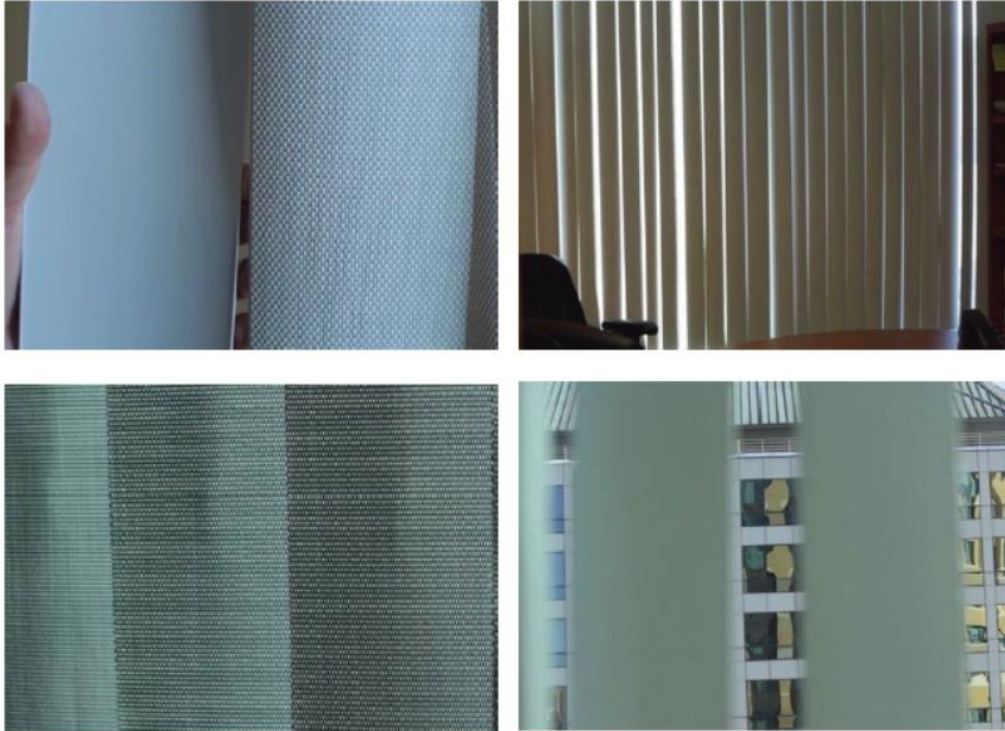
Indoor views of the existing indoor vertical blind system in the Oakland Federal Building. Upper left: blind with white opaque backing; lower left: fabric blind without backing, which was typical throughout the building.
